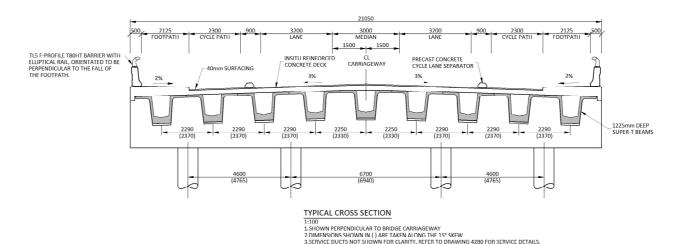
TYPICAL BRIDGE CROSS SECTION
